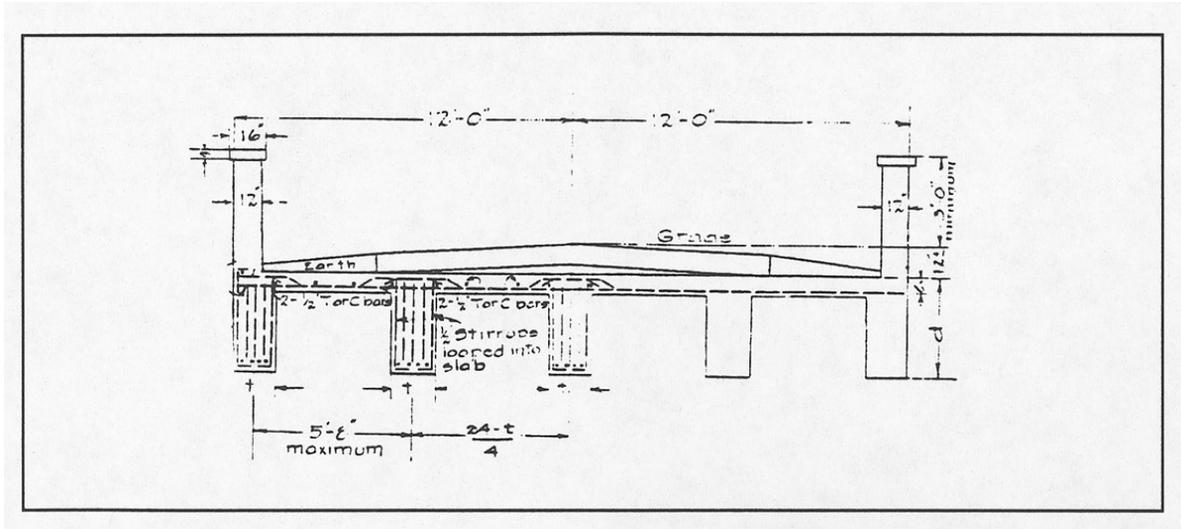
Girder Section from 1912 Standard Plans (Source: Maryland State Roads Commission 1912).
